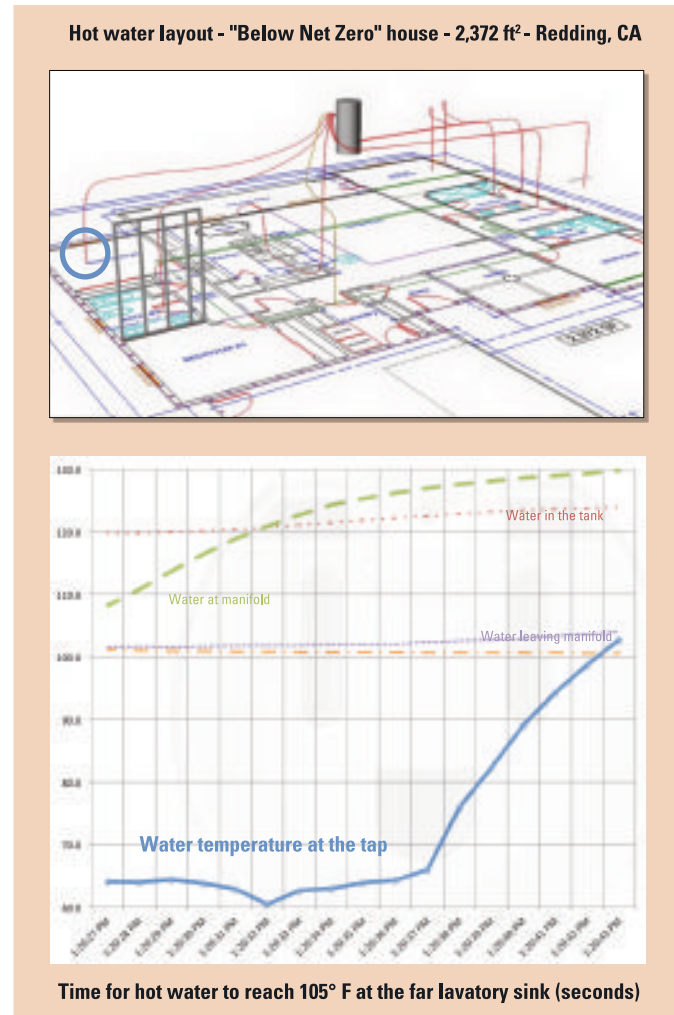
Long pipes above attic insulation - Hot water lags
